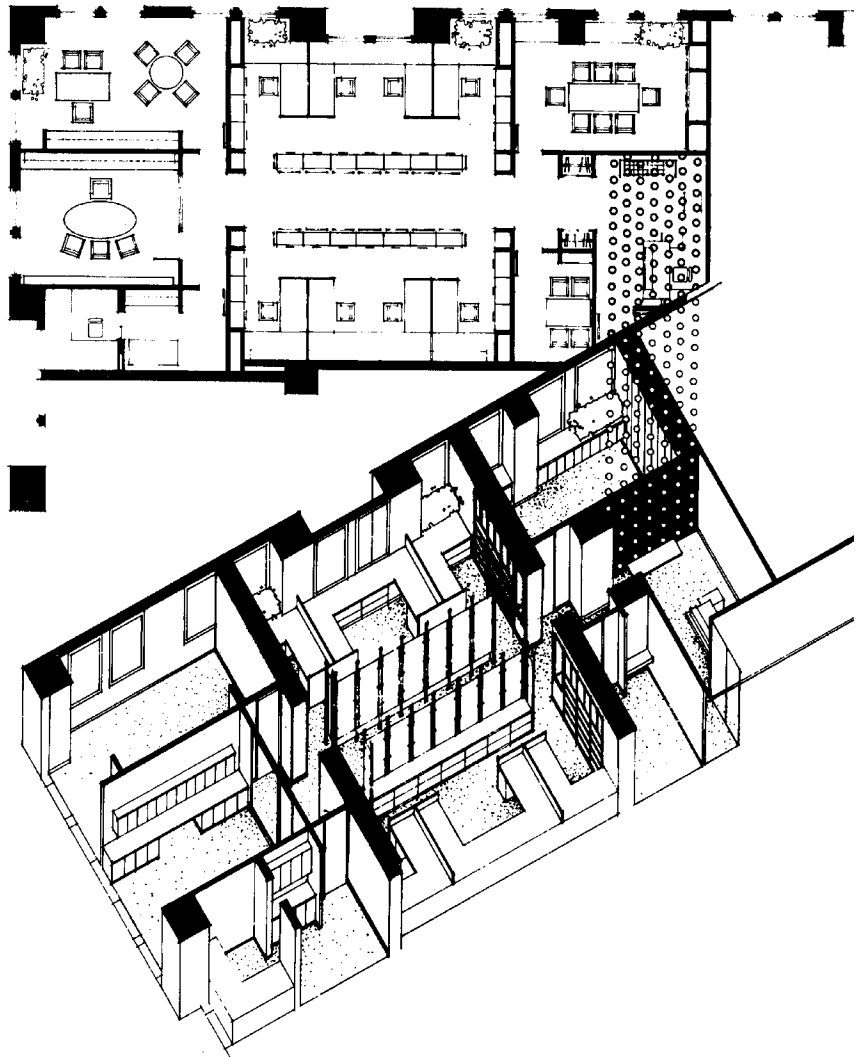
A plan oblique drawing retains the true size and shape of the floor plan. Here it is rotated to a 30/60° angle and heights are projected vertically.
